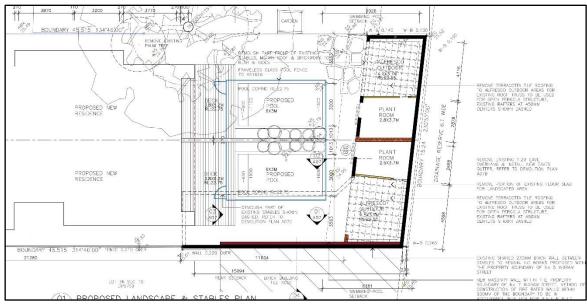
Rear Yard Plan – showing pools and ancillary structures at the rear
